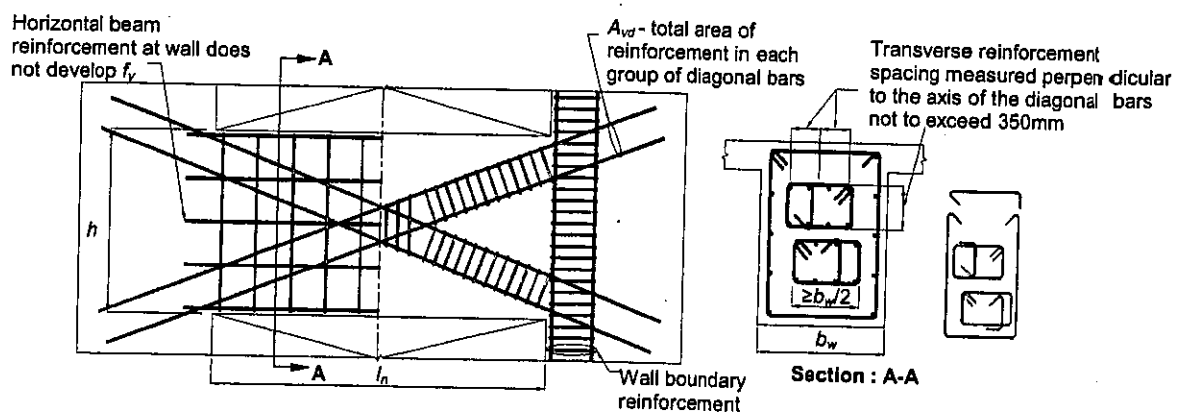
COUPLING BEAMS WITH DIAGONAL REINFORCEMENT
